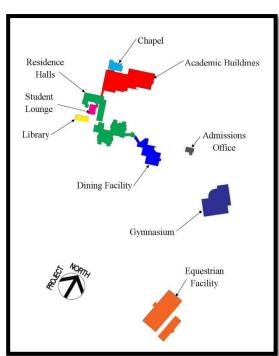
| Linden Hall Campus Buildings Drawings provided by Chambers & Associates
